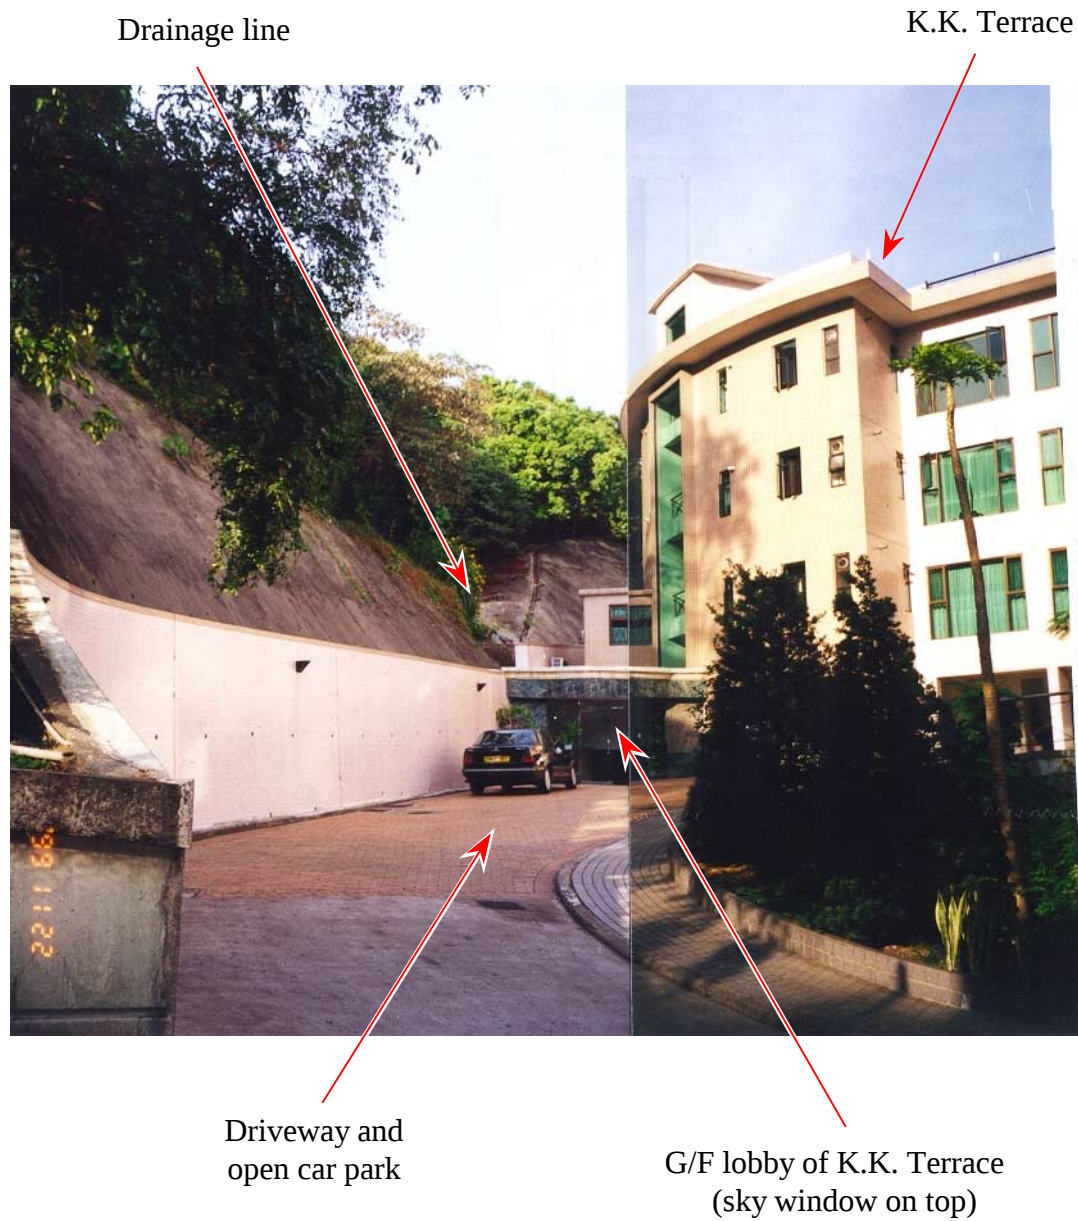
Open Car Park and Residential Building of K.K. Terrace
